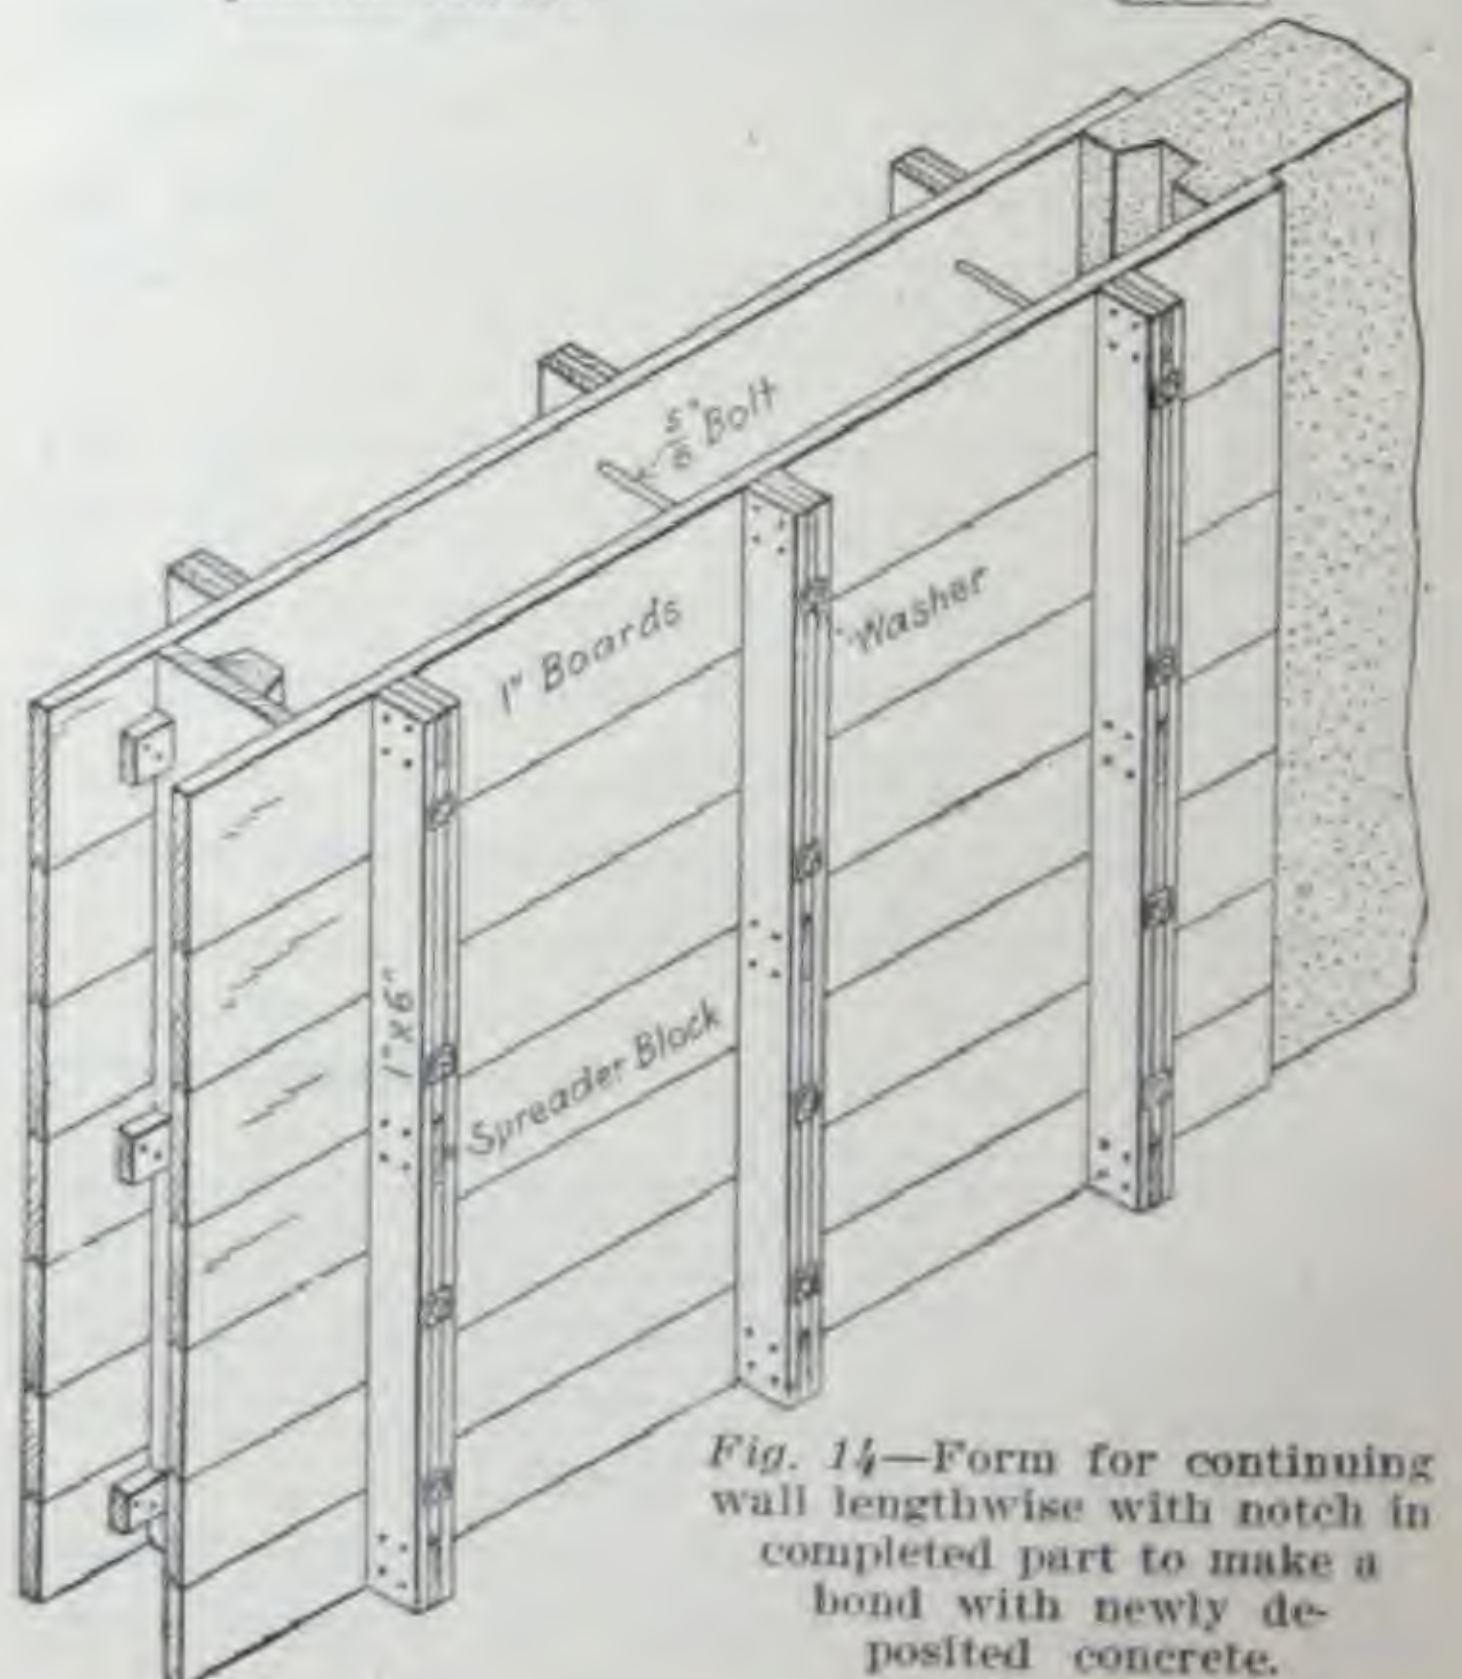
Form for continuing wall lengthwise with notch in completed part to make a bond with newly deposited concrete.
